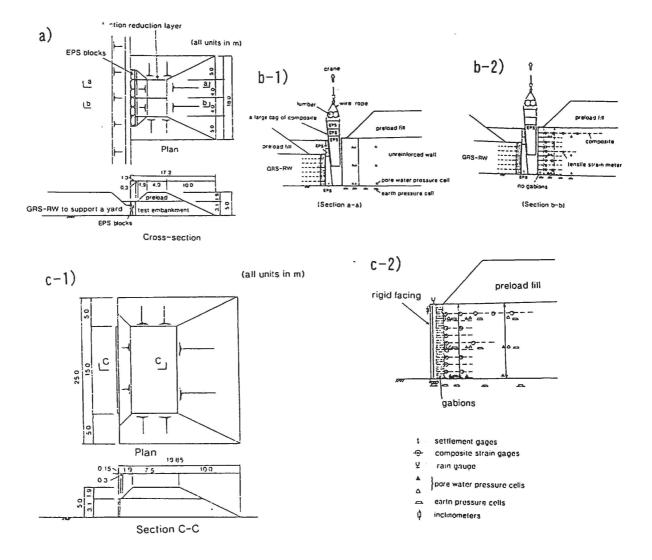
a) Overall dimensions of test embankment; b-1) unreinforced clay wall (section a-a in Figure a); b-2) wrapped-around clay wall (section b-b in Figure a); c-1) experimental part of the GRS-RW for Nagano Shinkansen (bullet train) yard; and c-2) experimental GRS-RW (section c-c in Figure c-1).
